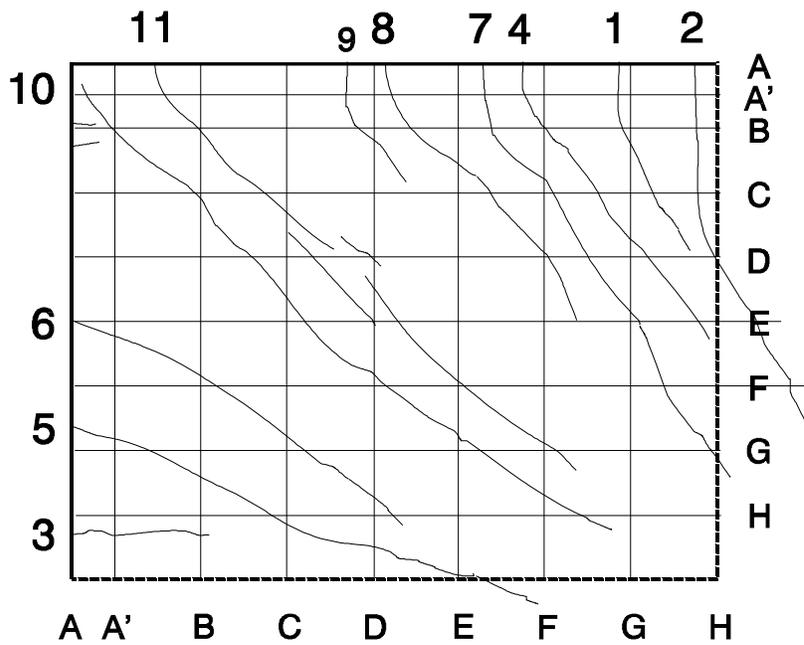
POJ-RC-100 cracking pattern on north face of joint at service load
